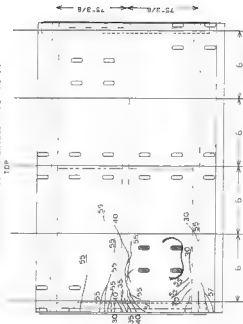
Top Cracking Pattern (Fourth Bridge - Test No 7)
